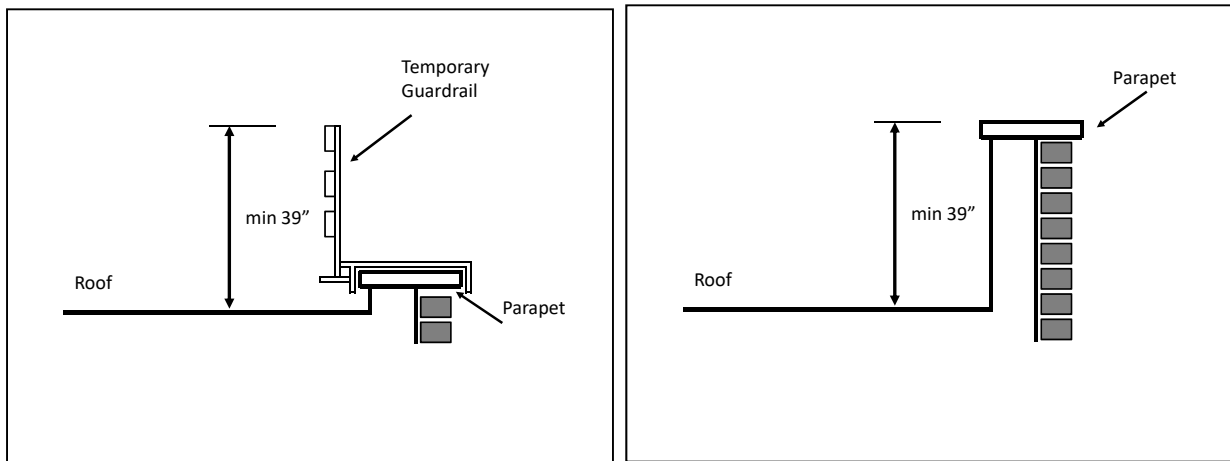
Roof parapet with temporary guardrail (left), and parapet with increased height (right)
